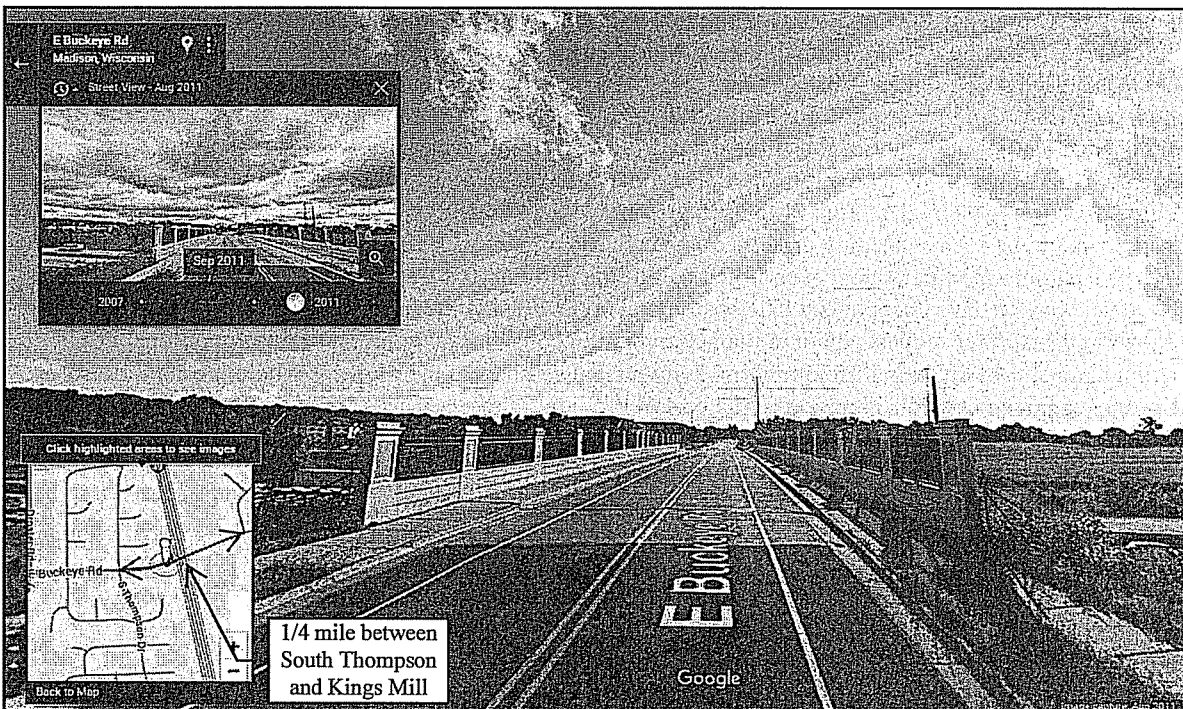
Google Streetview image looking east towards Richmond Hill neighborhood, across the East Buckeye Road bridge in August of 2011 – after its reconstruction with pedestrian and bike facilities.
